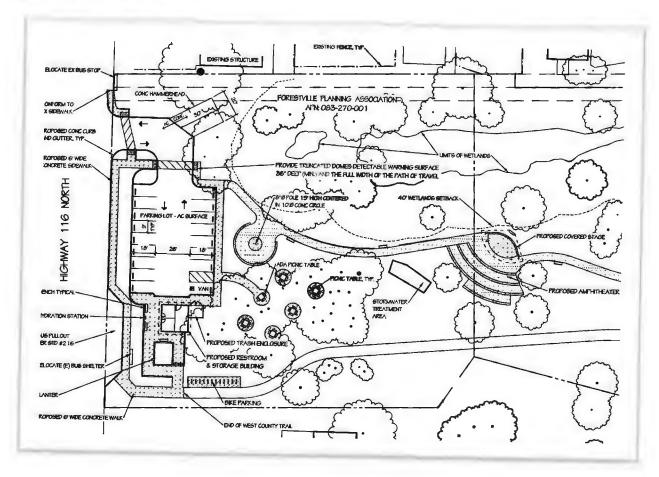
Building Plans and Elevations for Amphitheatre and Restroom/Storage Building
